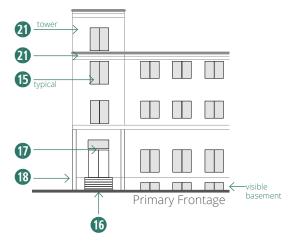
H-3. Civic Building: Facade Design Requirements
